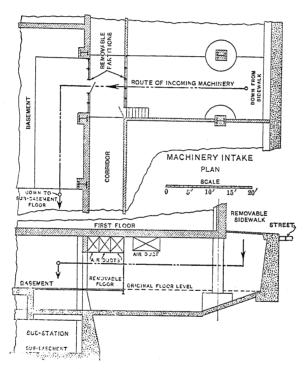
Plan and Sectional Elevation of Machinery Intake
